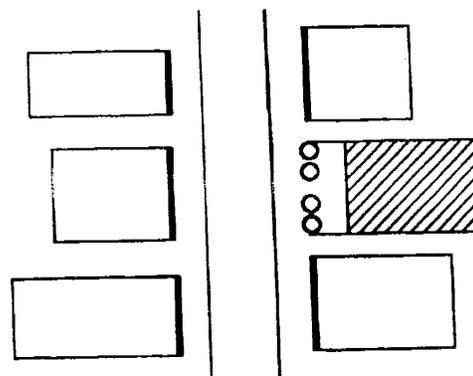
Architectural or landscape elements (such as fences, walls or plant materials) can be used to help maintain the setback line when the building itself is set back.
